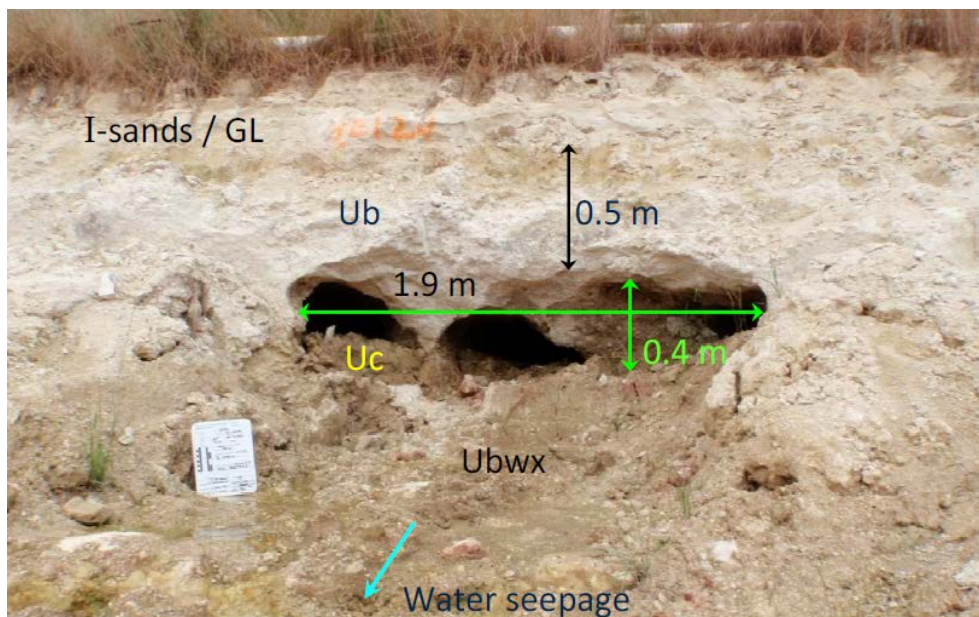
Photo of cave feature in soil observed in deep excavations at Plant Vogtle, Augusta (Larrahondo-Cruz 2011). Notes: Ub – hard Utley limestone, Ubw – brittle Utley limestone, Uc – Putley soil (very soft clay deposits, bottom of observed caves)
